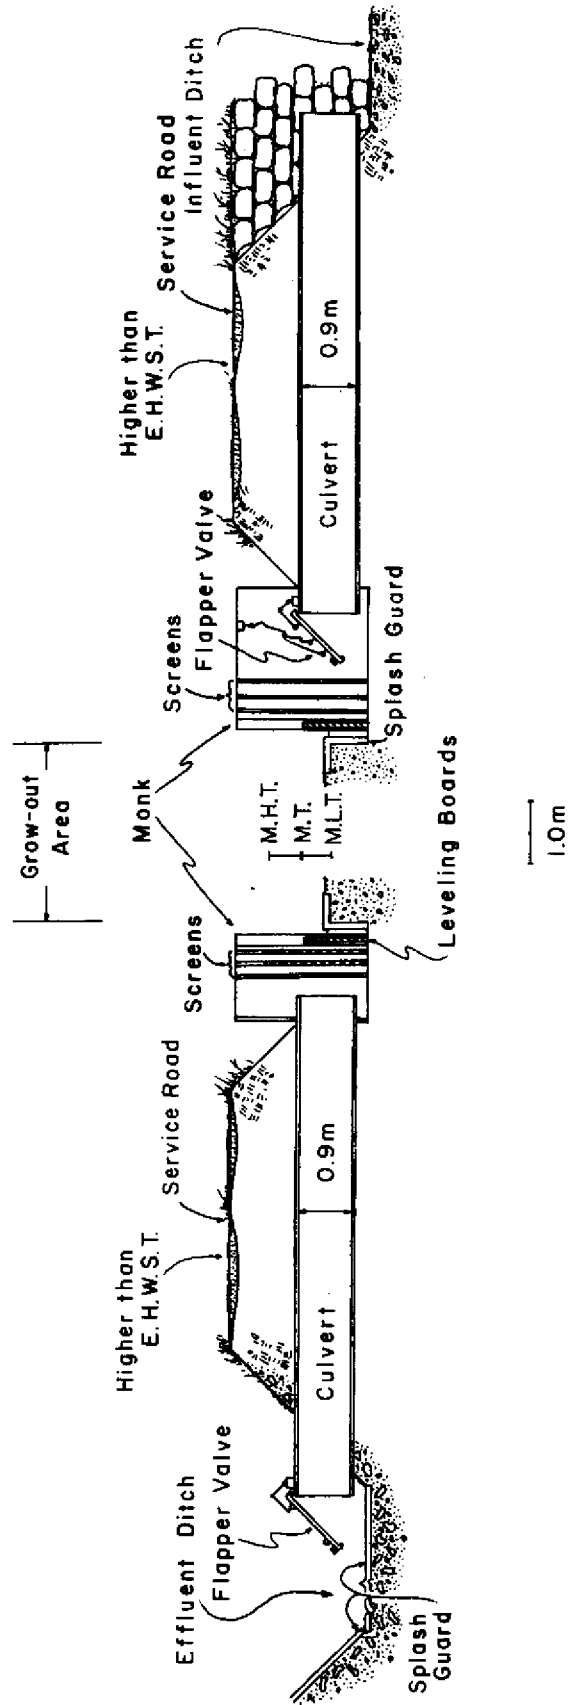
Details of embankments, monks and culverts with one-way flapper valves suggested for use in Option 11. Exact design of the valves is now shown. Culverts are cleaned on spring low tides. (M.H.T. - mean high tide; M.T. - mean tide; M.L.T. - mean low tide; E.H.W.S.T. - extreme high water spring tide).
